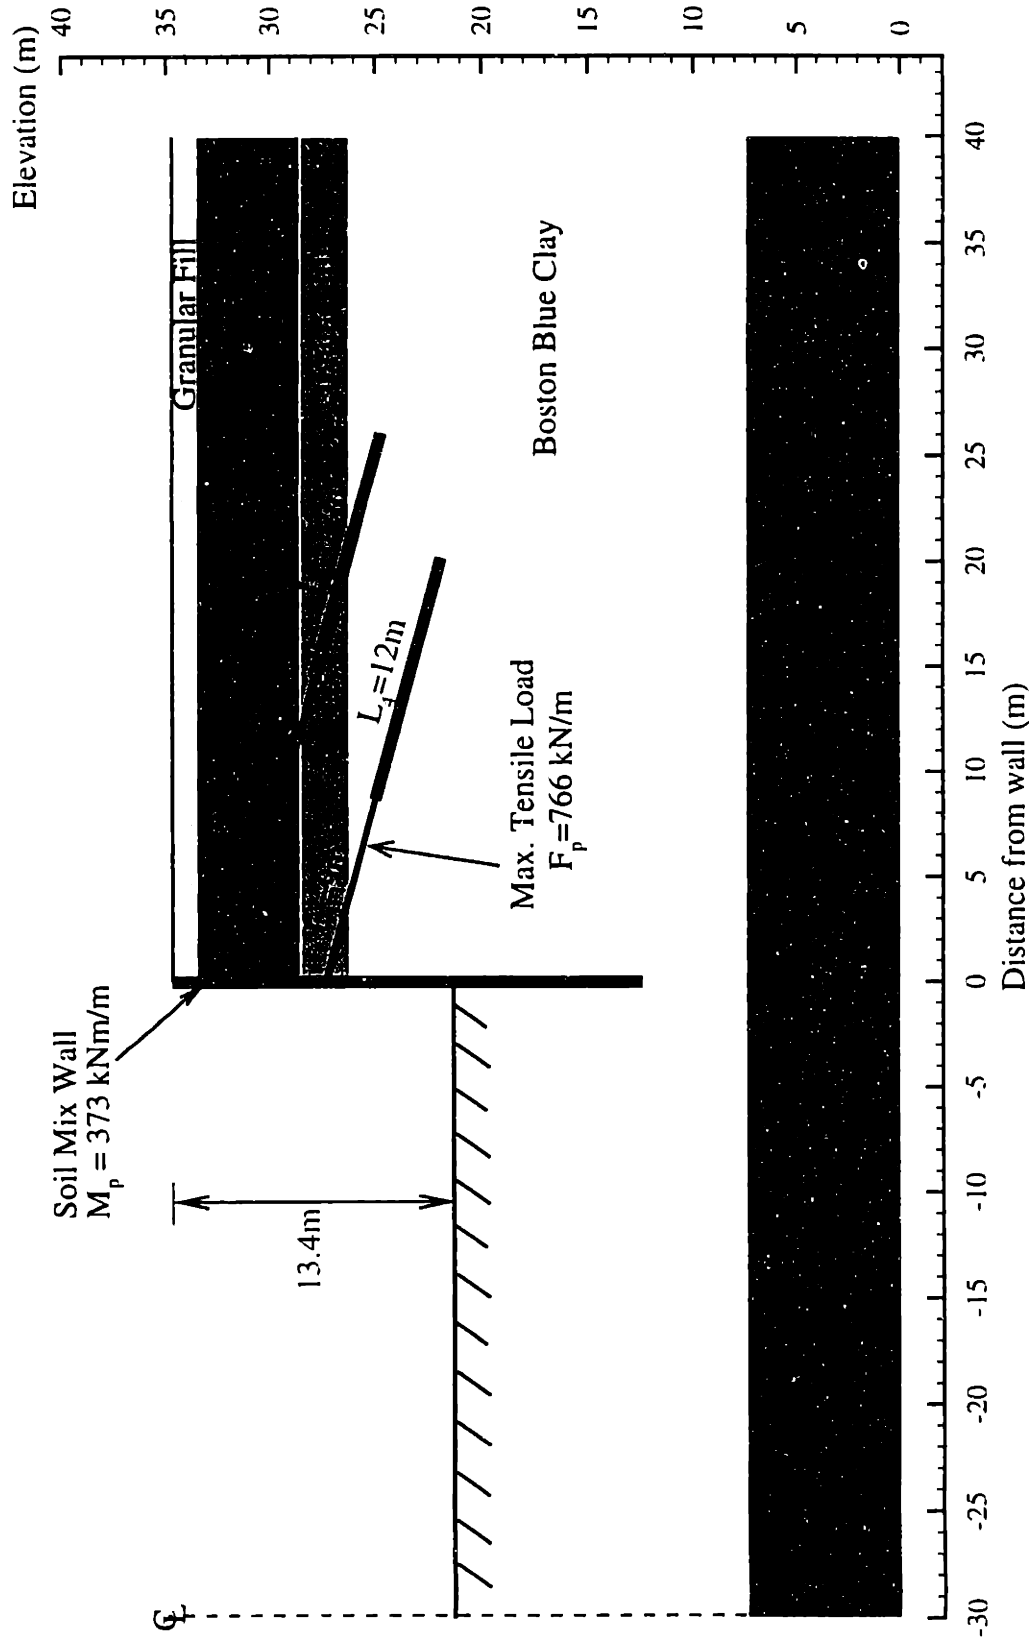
Cross section of East wall Section A-A' (Failure)
